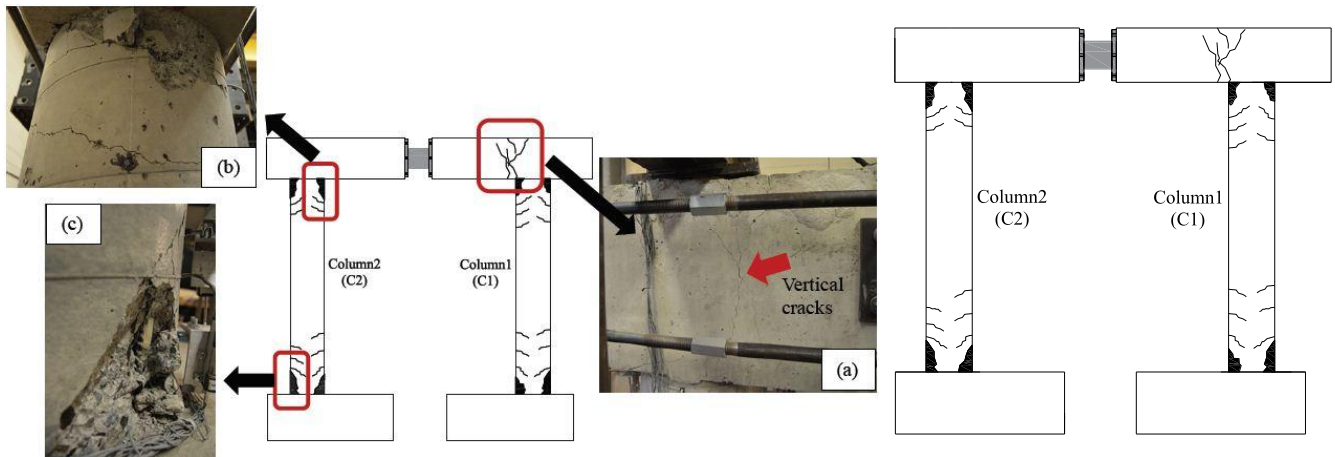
Imposed Damage in As-built Bent: (a) cap beam cracks; (b) significant spalling in columns, (c) onset of rebar buckling
